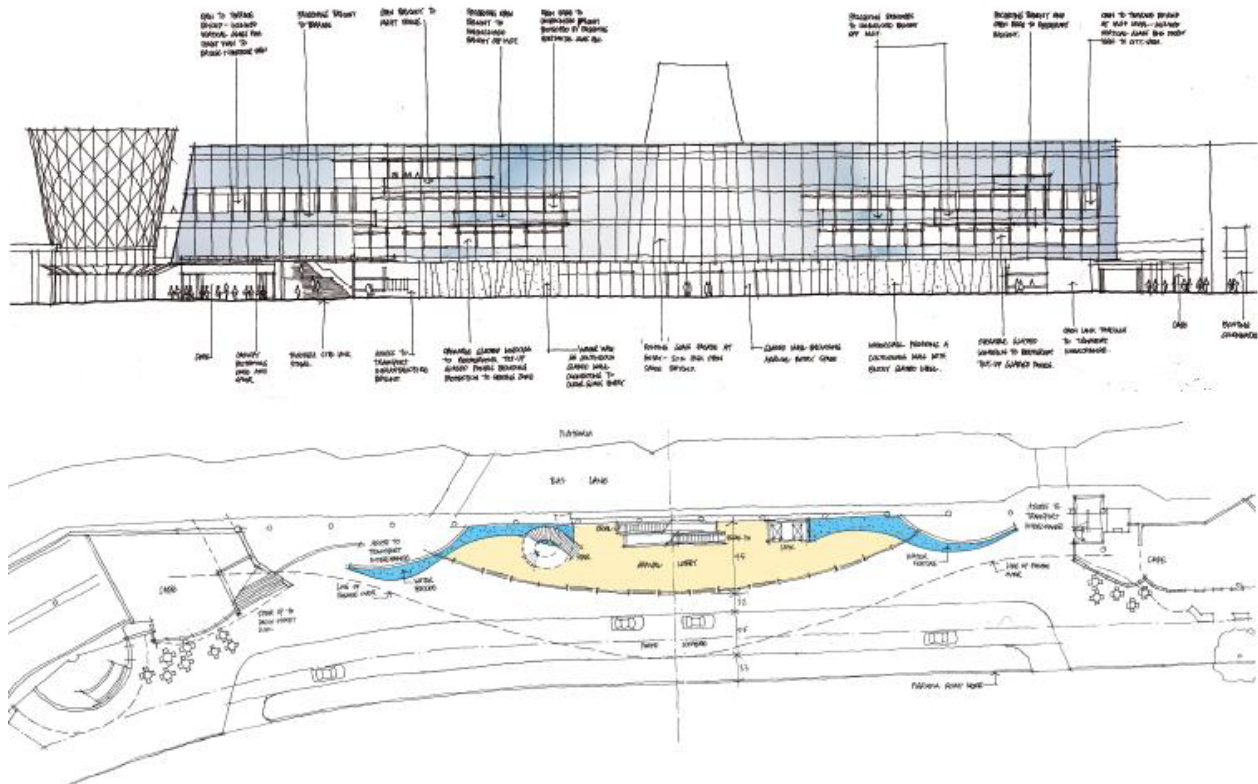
STAR project proposed new façade and canopy glazing facing Pirrama Road
